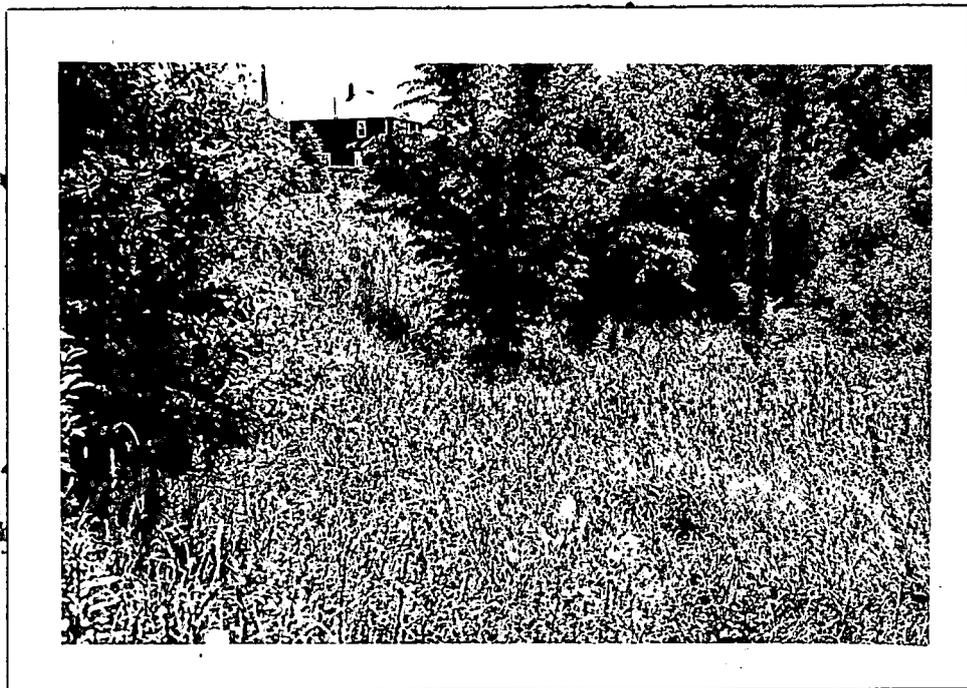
Hwy. 551, Site of Proposed Retaining Wall, photograph looking south showing marsh area
